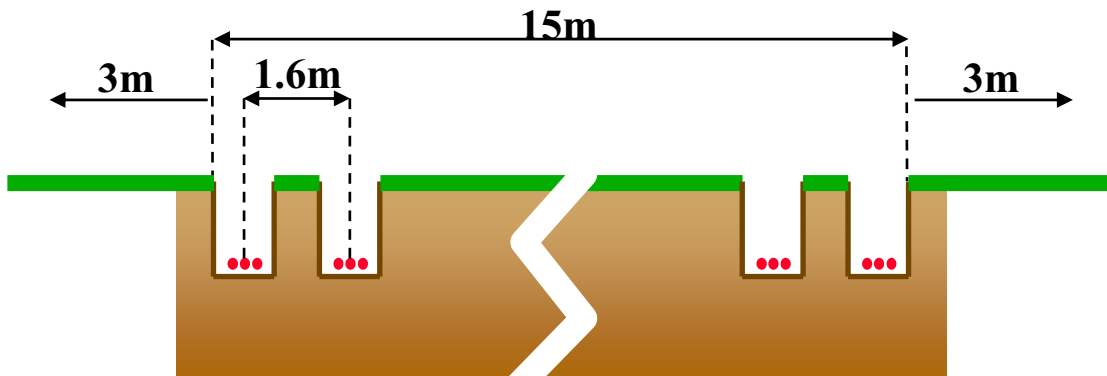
Trench cross-sections for an extra-high voltage (400 kV) cable system
